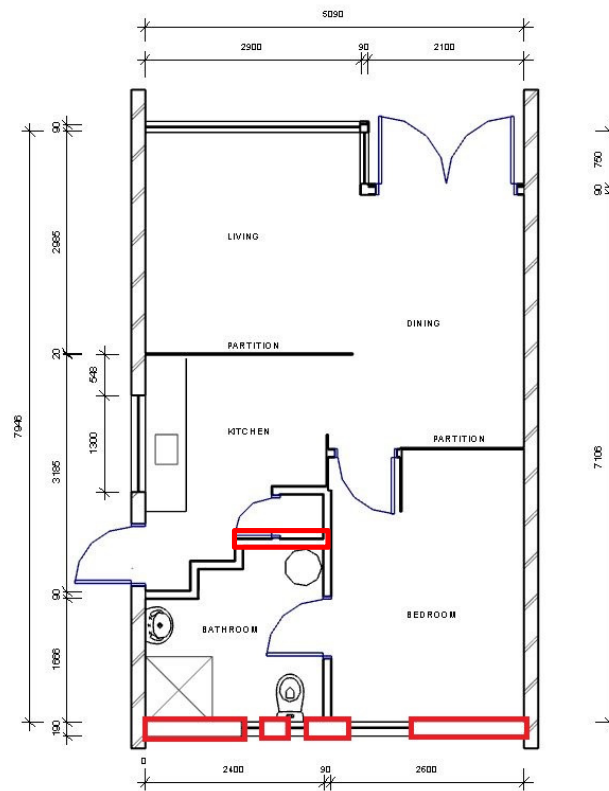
Walls used for bracing in the longitudinal direction residential units.
